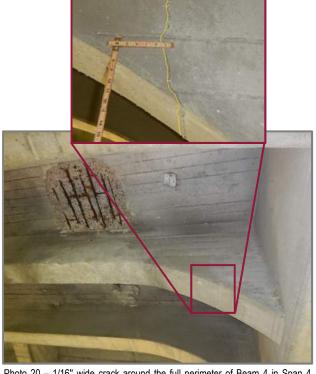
1/16" wide crack around the full perimeter of Beam 4 in Span 4 (looking north at the forward end near Pier 5). Crack outlined in yellow.
